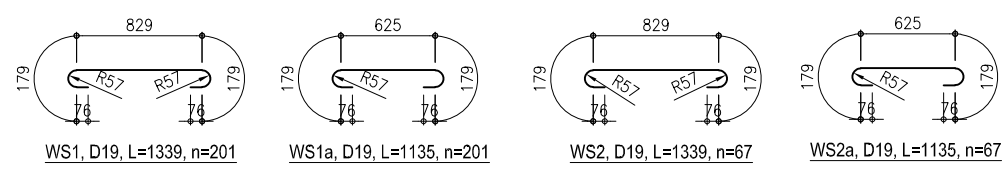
DETAIL OF STIRRUP / CHI TIẾT THÉP ĐAI
